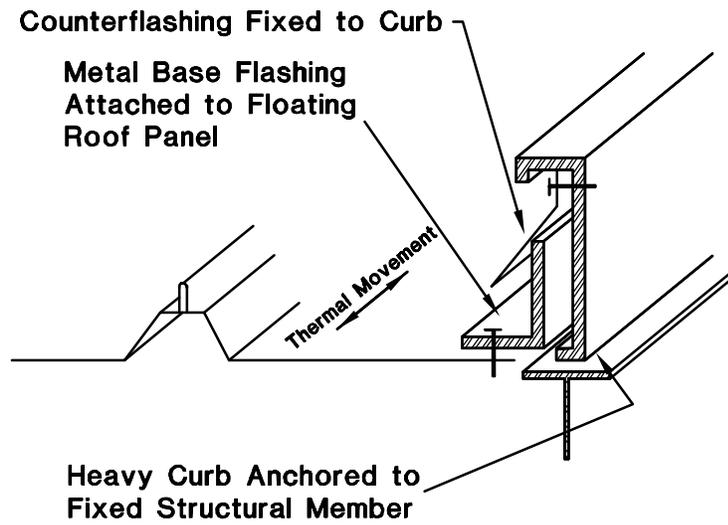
Fixed Curb to Support Heavy Rooftop Units with Floating Base Flashing
